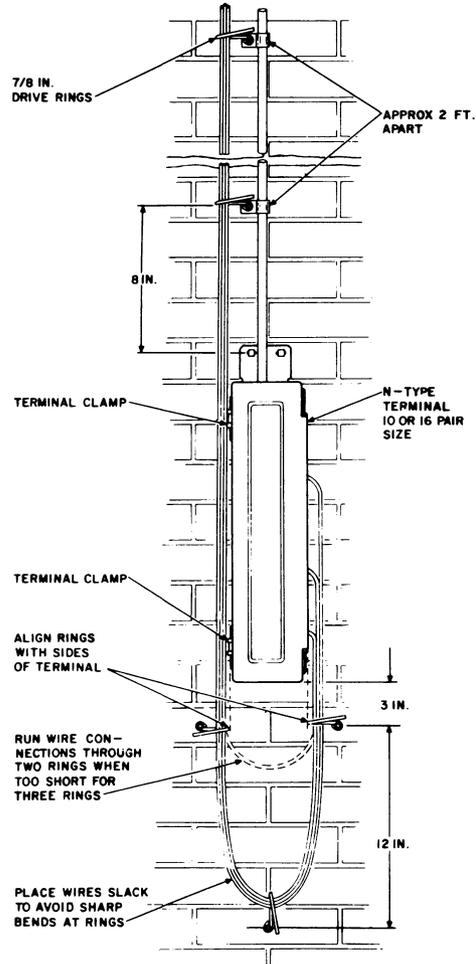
Wall-Mounted 10- or 16-Pair Cable Terminal With Stub at Top
